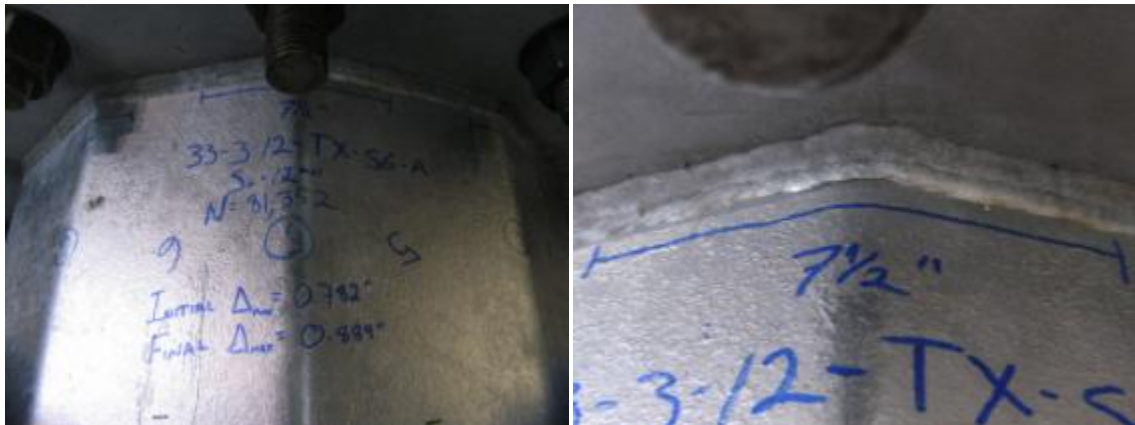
Crack Length at Bend 5 on the Galvanized Specimen after 81,326 Cycles
